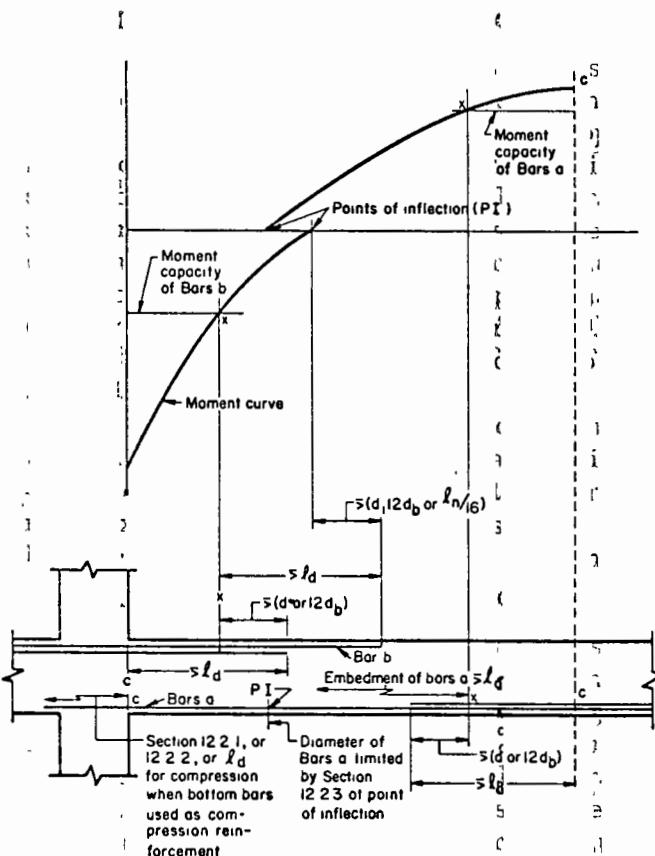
Critical sections for development of reinforcement in a typical continuous beam
